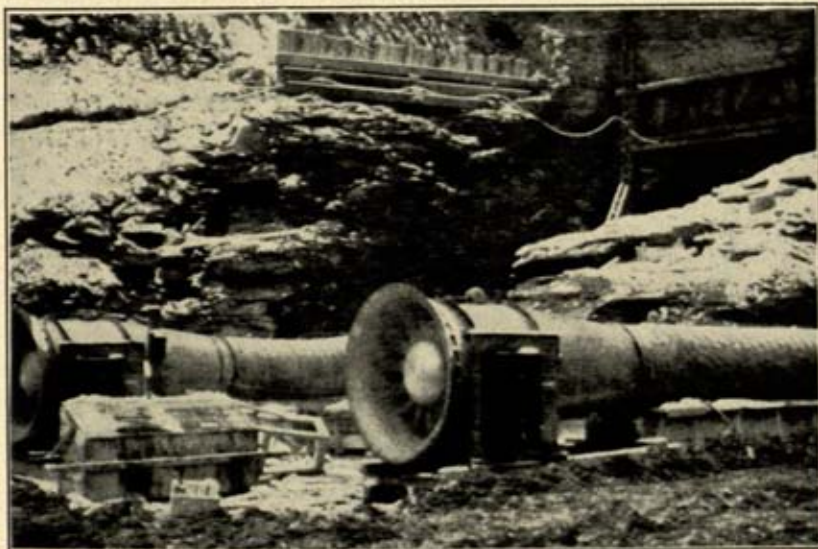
Twin radial fans used to ventilate the Squirrel Hill Tunnel. (*Joy Manufacturing Co.*)
